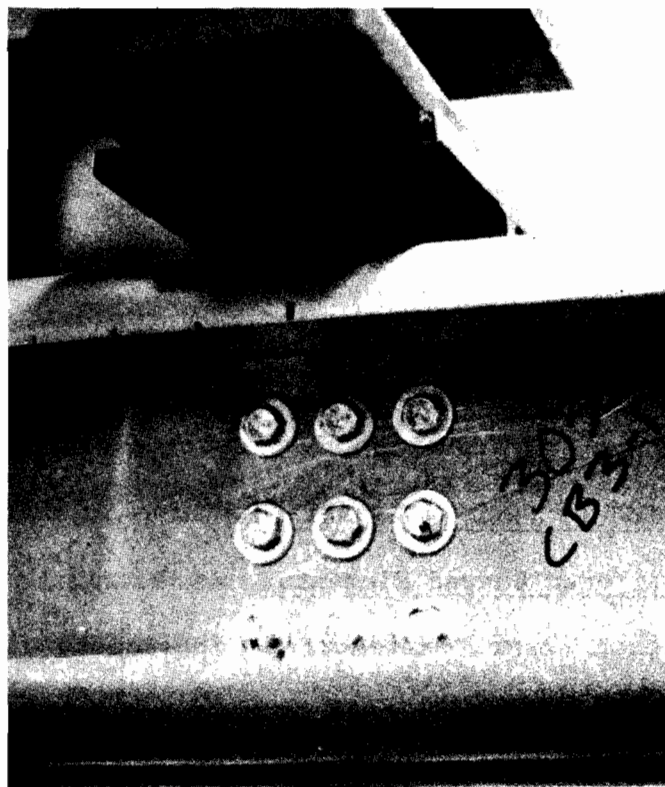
Closeup of T-Section Used to Apply Load to CB Beam Specimens
